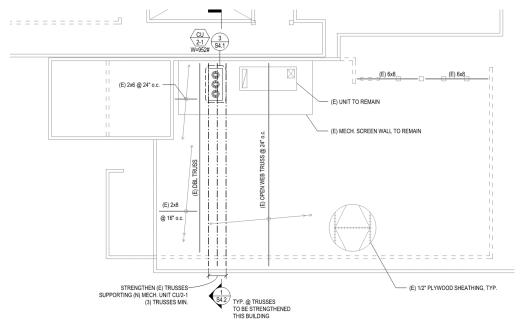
BUILDING 2: 2017 HVAC Upgrade Roof Framing Plan
